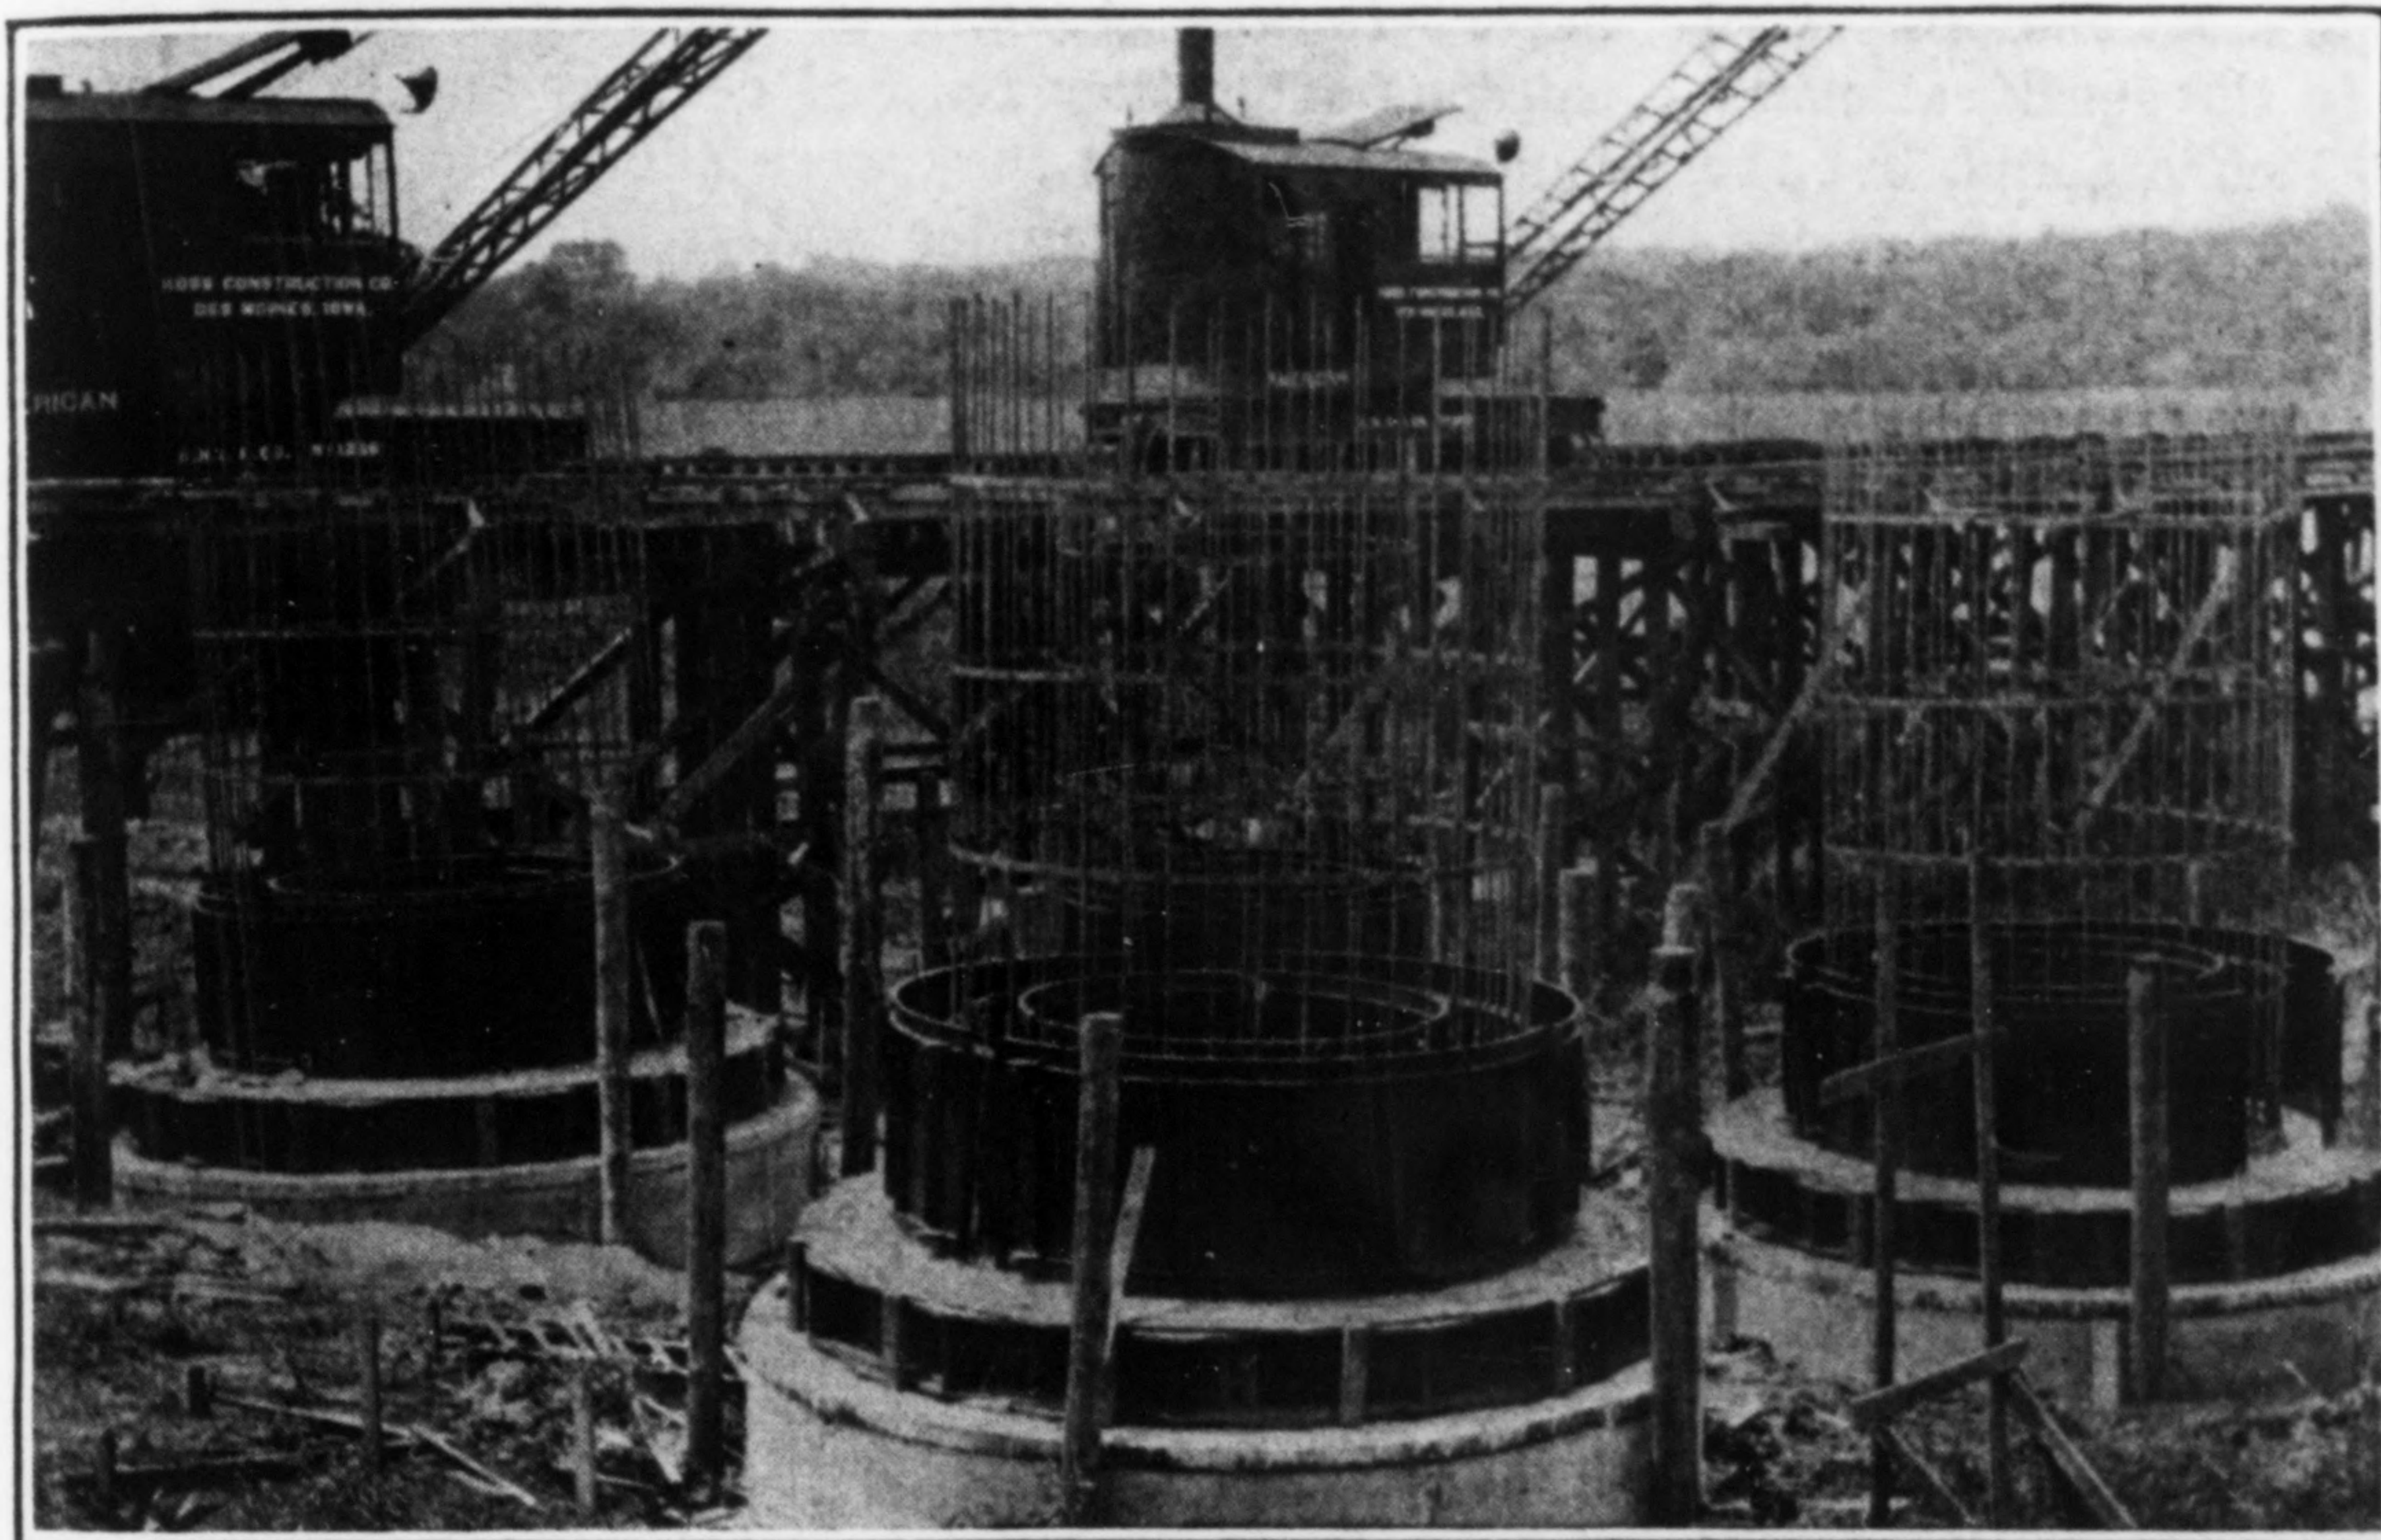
(ABOVE) SINKING PIER CAISSONS
